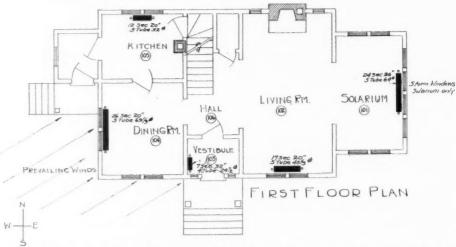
First floor plan showing rooms and radiators, location and size, prevailing winds and exposures.
